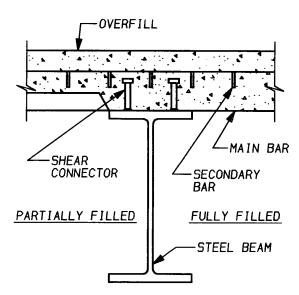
An Acceptable Shear Connection of Partially and Fully Filled Grid Decks to Beams
